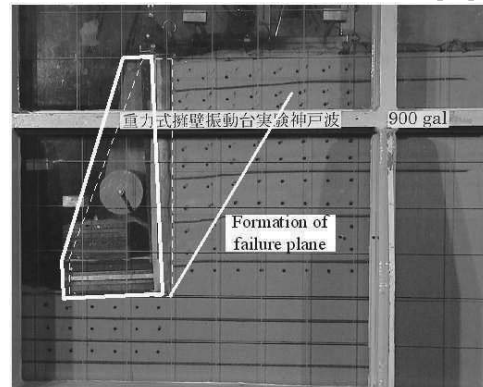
Residual displacement of retaining wall model and formation of failure plane in the backfill soil
